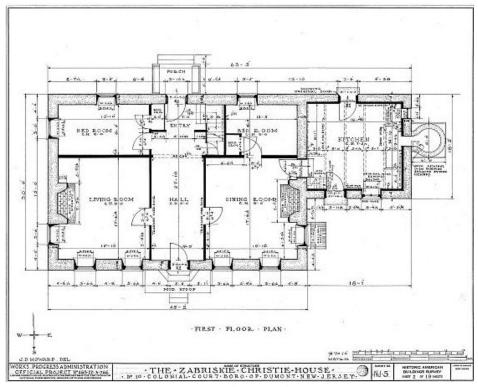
The square plan of the original section of the house (right wing), large fireplace on the gable end wall and exterior doors on each side is similar to the original house the Buckelews built. HABS NJ,2-DUMO
